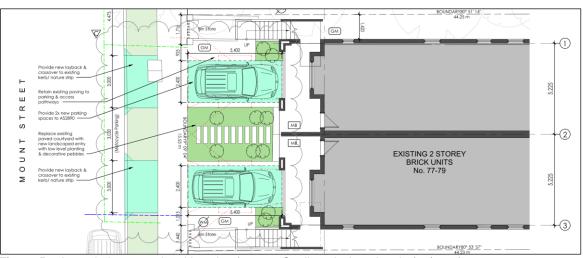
Amended proposed parking plan (source: Studio23design, dated 9/05/2025).
